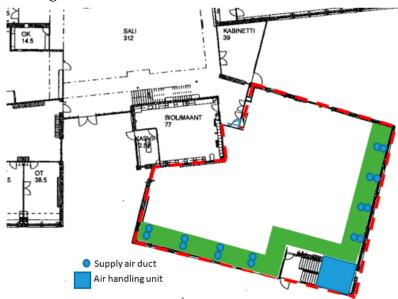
Location of the underground supply air chamber: air handling unit, corridors, and terminal units of supply air ducts leading to the first- and second-floor classrooms.
